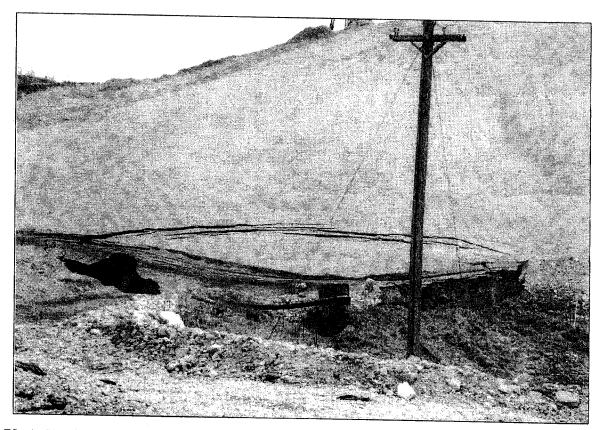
April 4 sinkholes and depression, looking south, photo taken on April 6.
